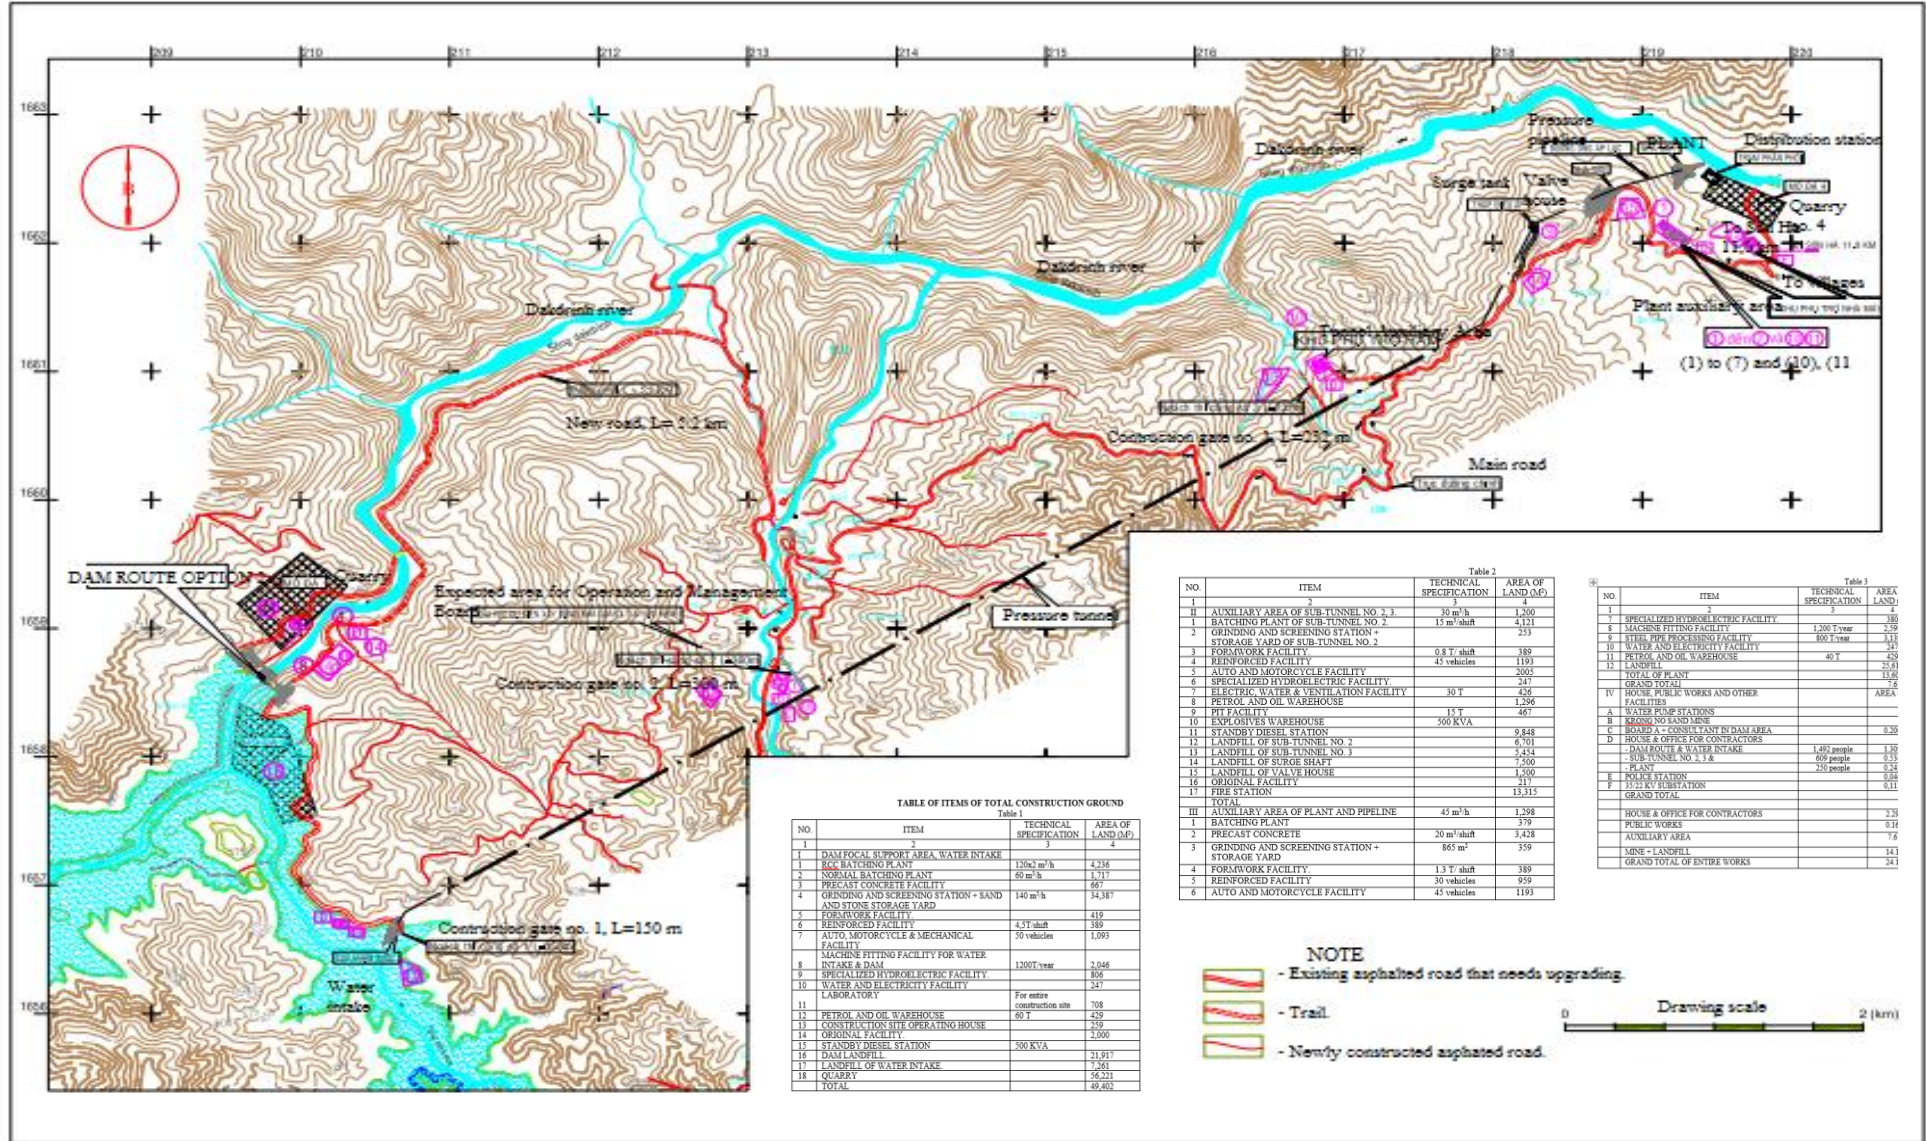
TOTAL CONSTRUCTION GROUND - PROPOSED PLAN
